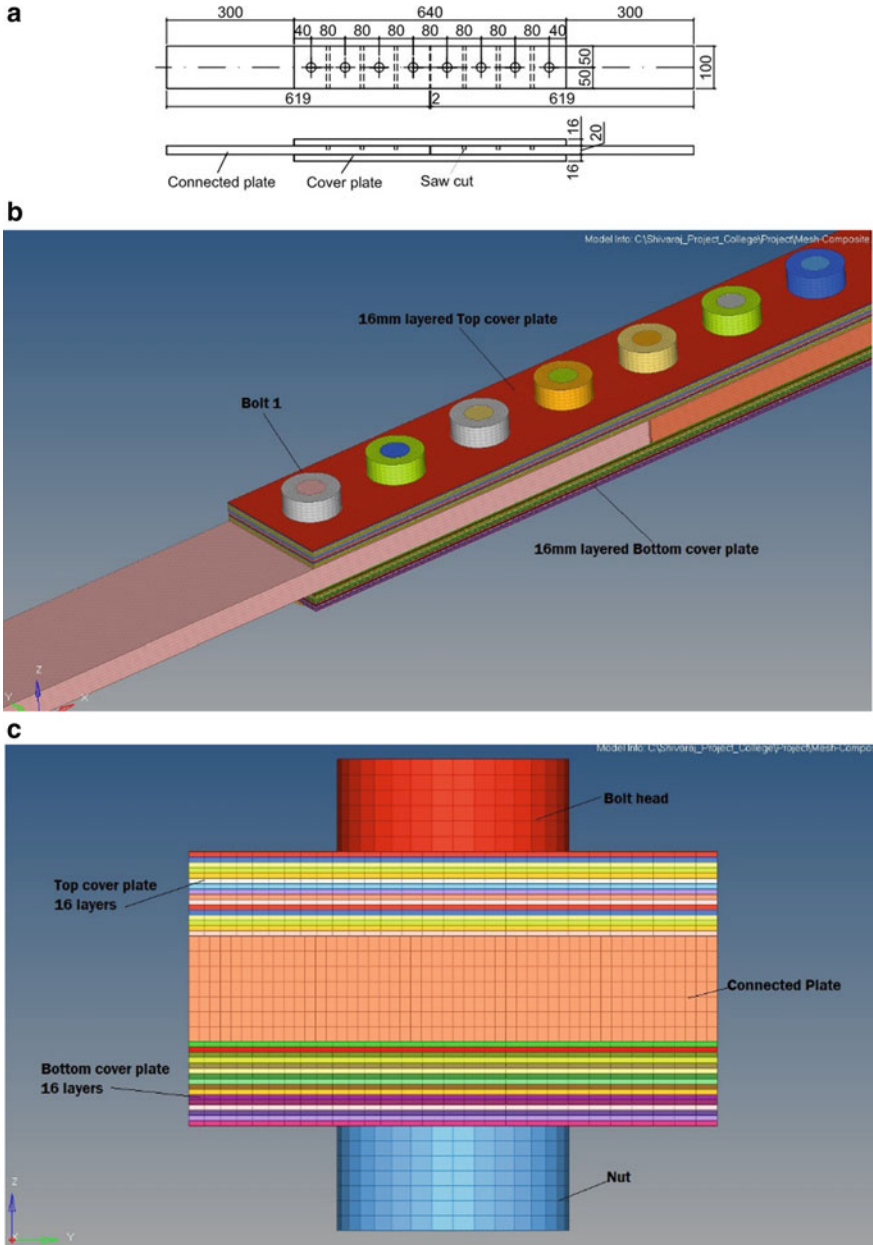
a Geometry of the specimen. b Meshed model of 16 mm layered CFRP-Steel cover plate. c 16 mm CFRP-Steel cover plate-side view
